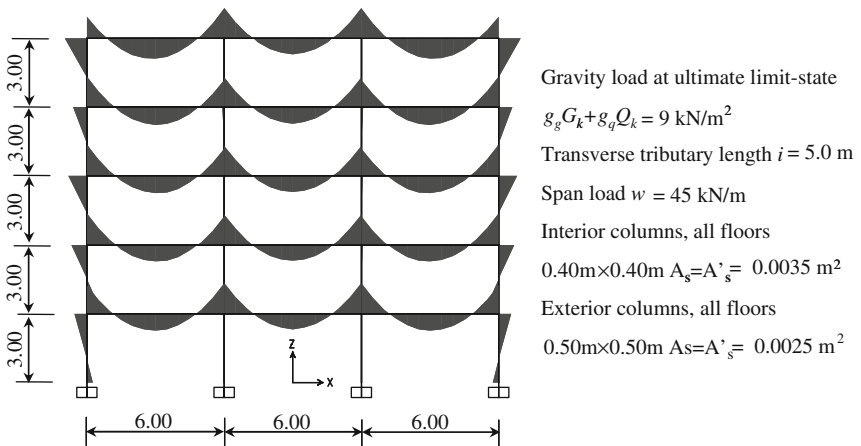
Dimensions and loads of the 5-storeys 3-bays plane RC frame
